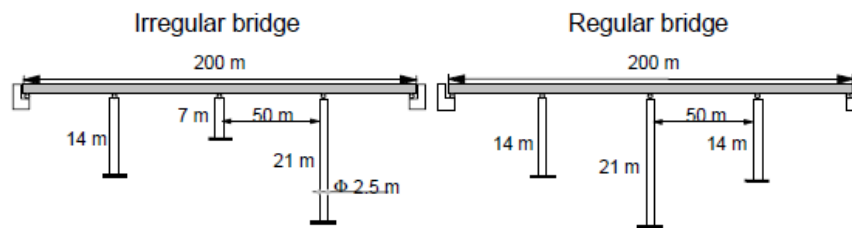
Layout of the bridge configuration, the central pier of the irregular bridge and the lateral one of the regular bridges, the ones experimentally tested.
